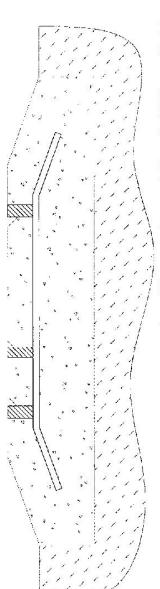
Cross-section of Concrete Encased 5" and 7 1/4" Gauge Miniature Railway Track Bed
